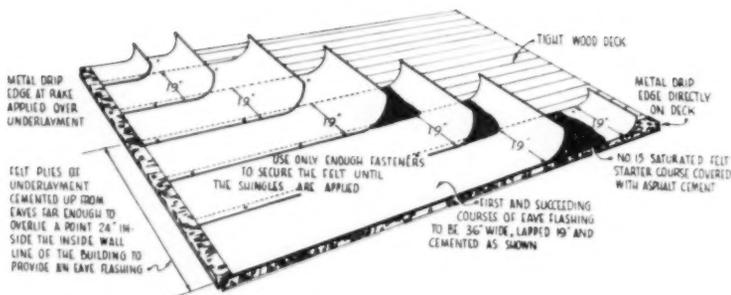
Two layers of No. 15 asphalt-saturated felt are applied with a 19-inch lap
